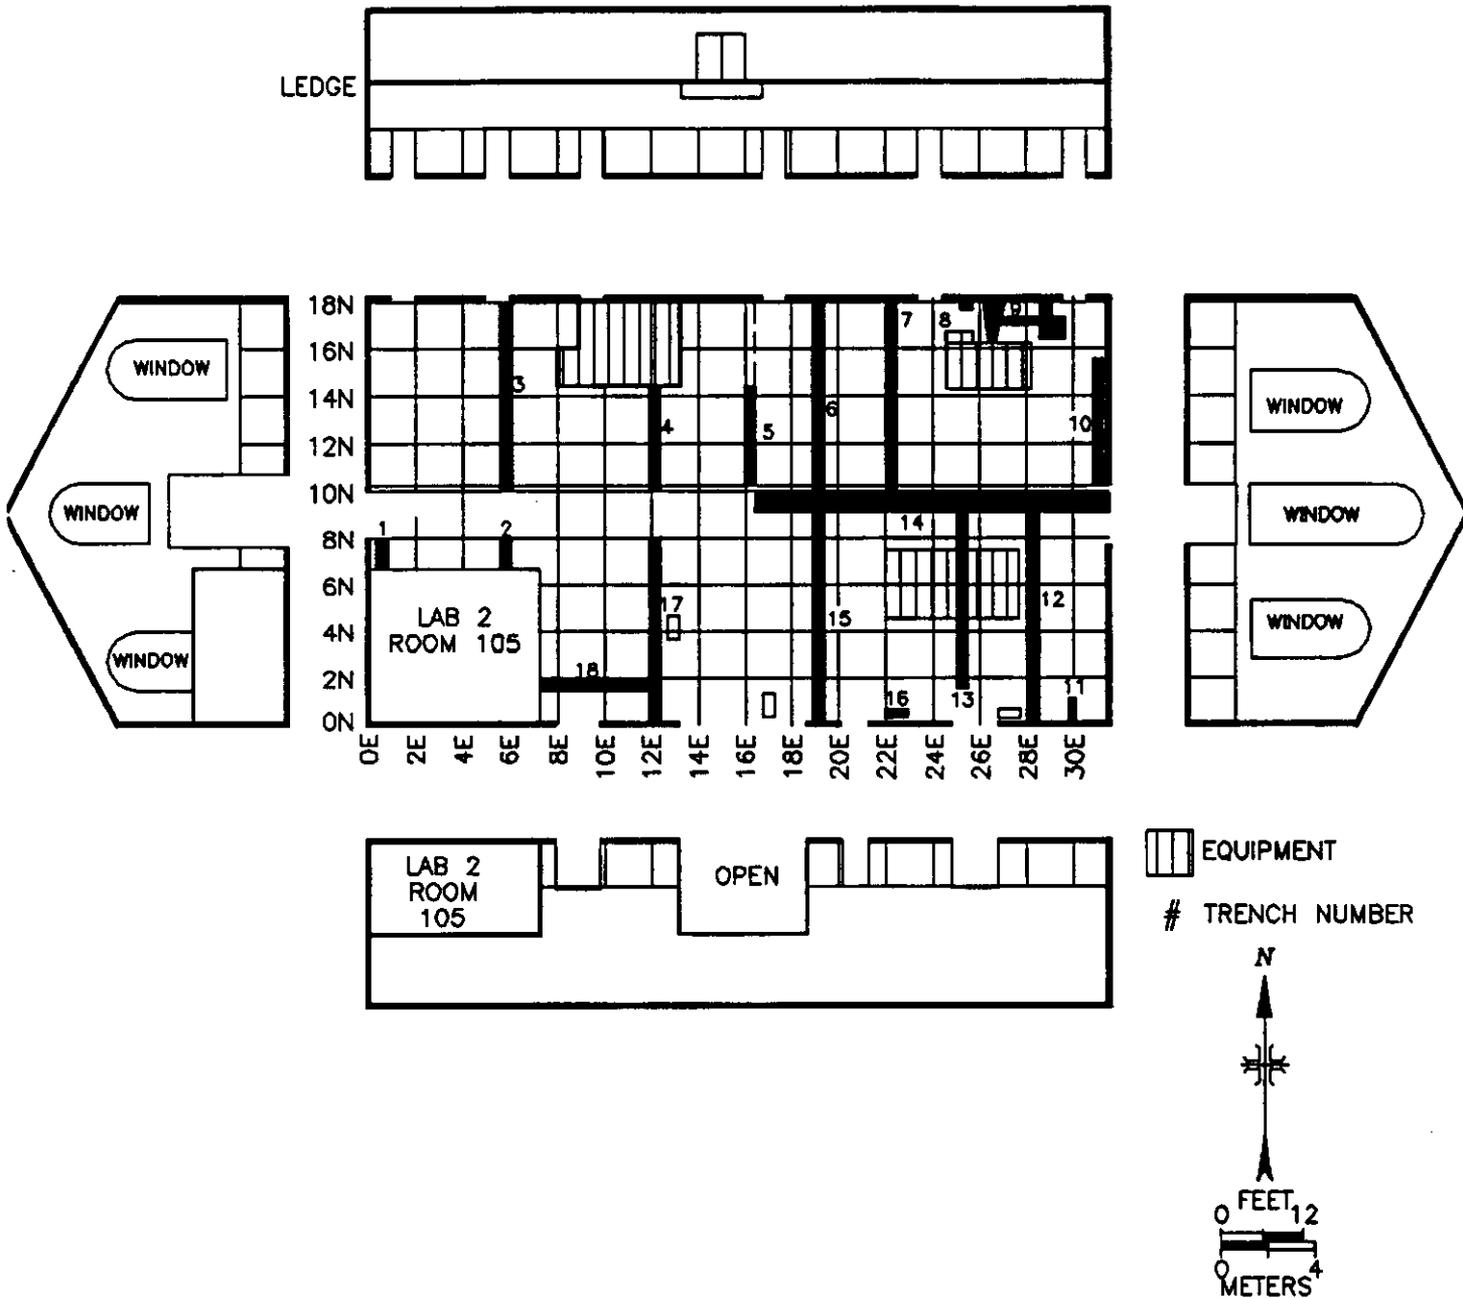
ARC Lab 1, Building 23 Showing Reference Grid and Trench Locations
